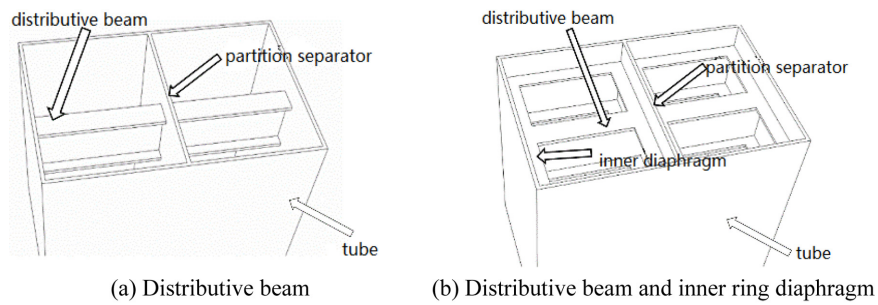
Two Kinds of Vertical Load Transferring Detailings in Large-Section CFT Columns.
